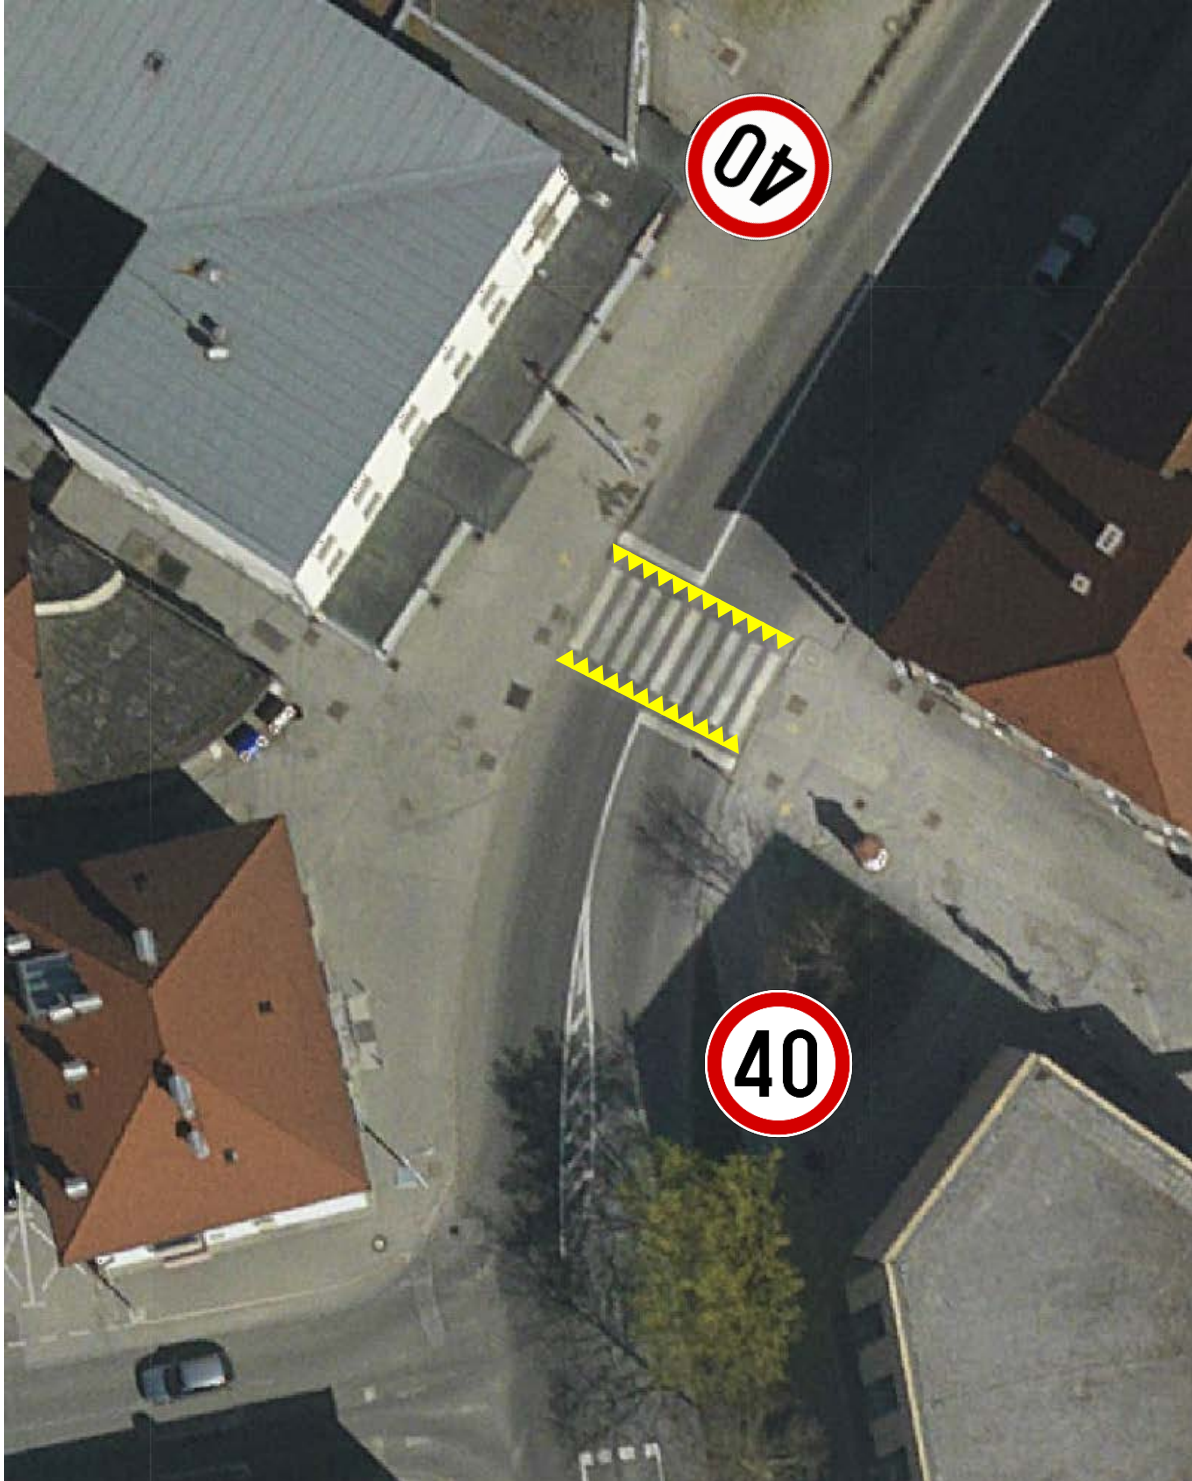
Implementation ready road layout plan for location Trg zborá odposlancev 64
